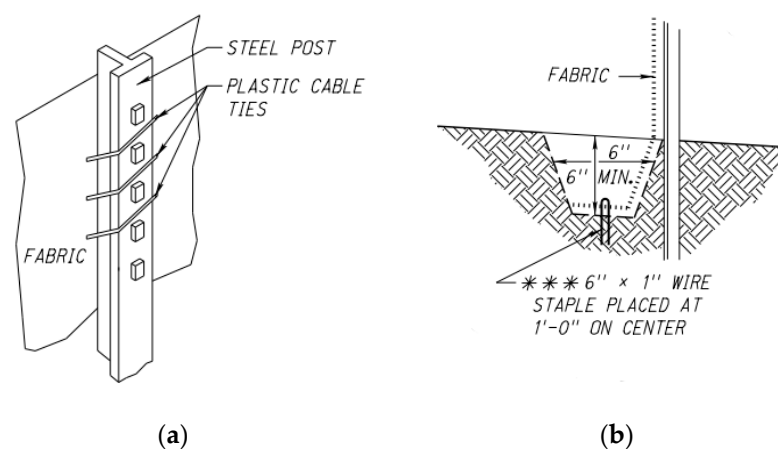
Nebraska DOT standard silt fence [12]: (a) anchoring detail; (b) trench detail.
